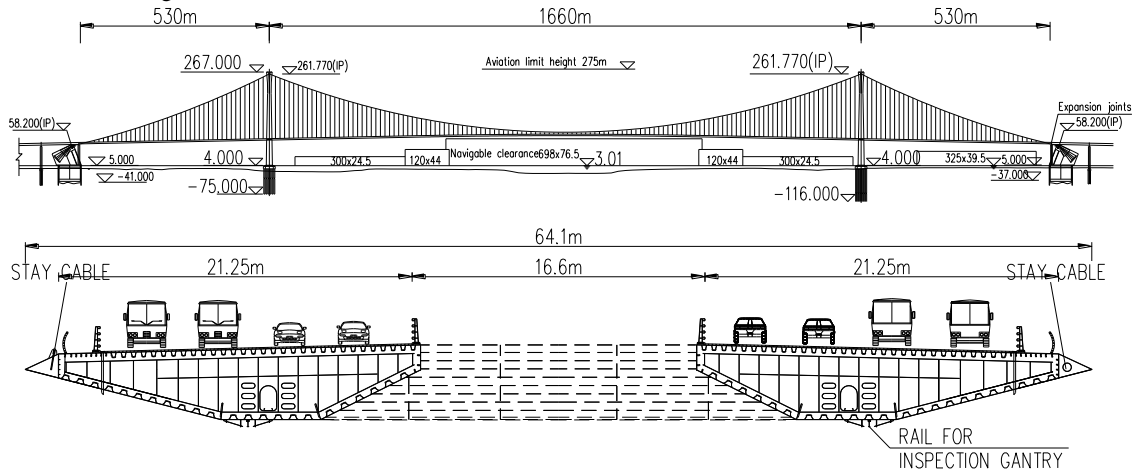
Twin-box girder section of Lingding Channel Bridge (m)
